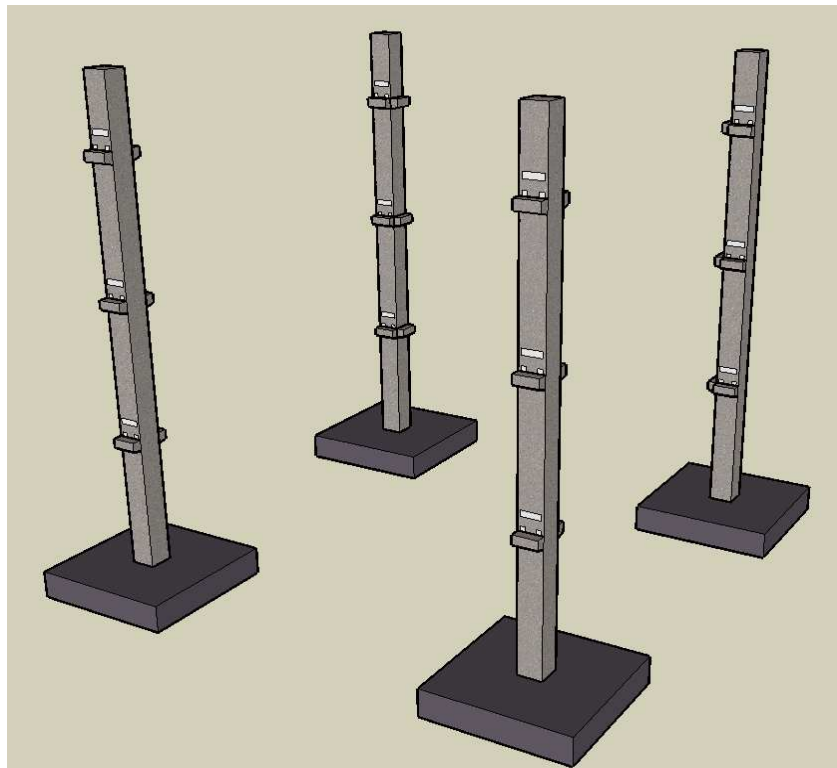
Erect precast columns cast with corbels and embed plates
